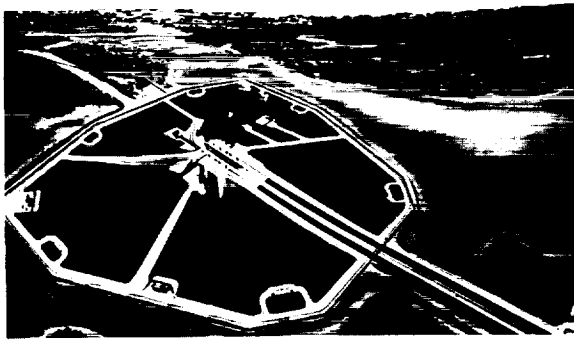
Closeup drawing of one pad, Launch Complex 39.
